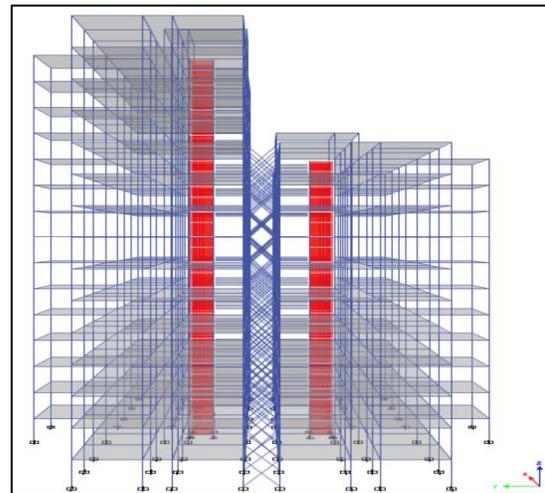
3D view of G+15 and G+10 adjacent Bare Building connected with X Bracings
